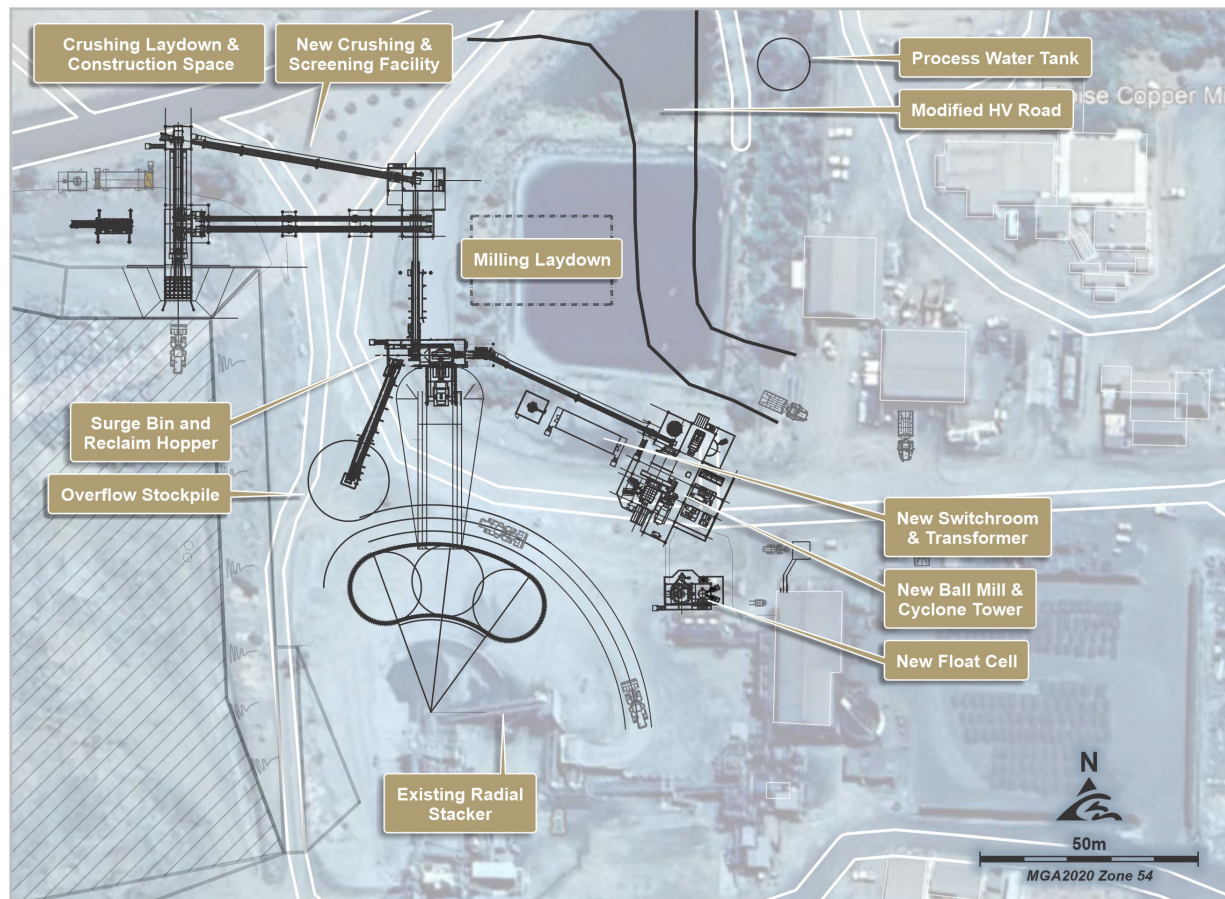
Eloise processing plant expansion – proposed new plant layout.
